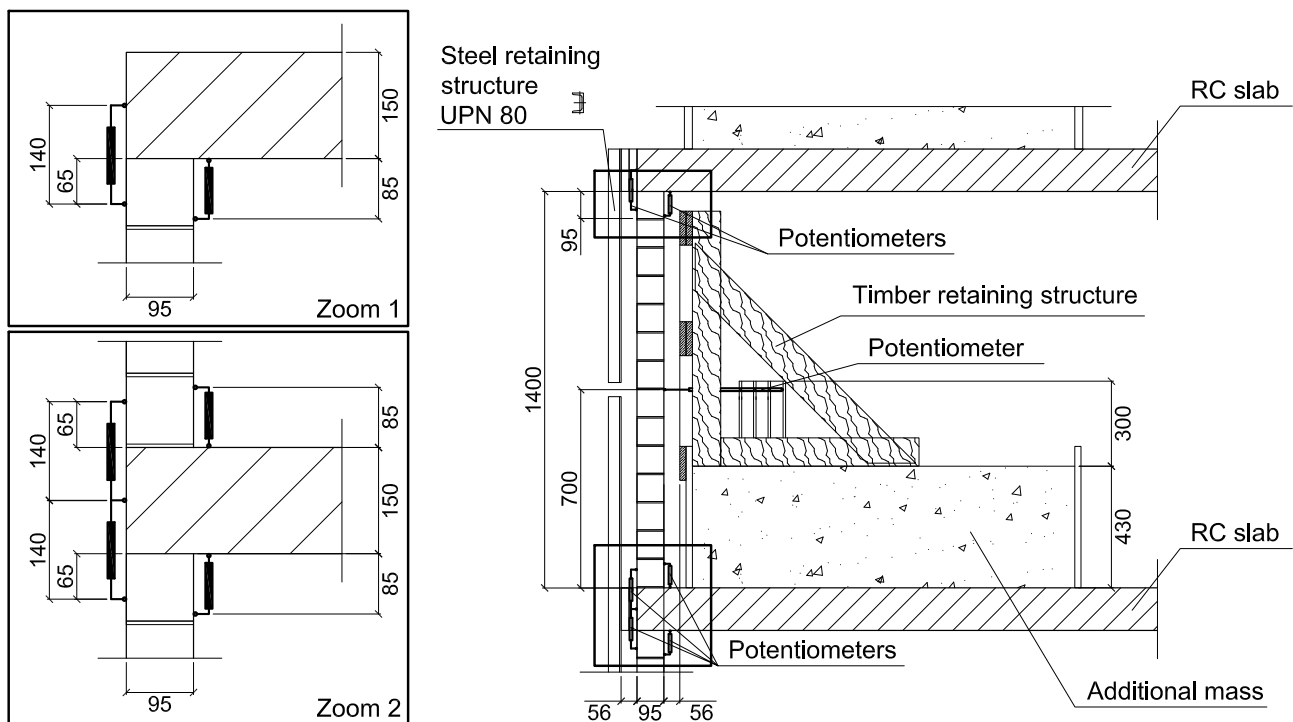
Vertical section of one of the out-of-plane loaded URM walls (dimensions in mm).
